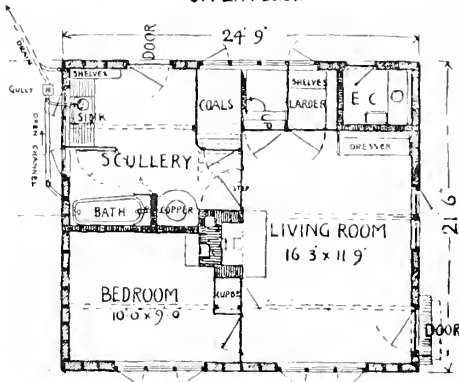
BRICK COTTAGE. A. RANDALL WELLS, ARCHITECT.
